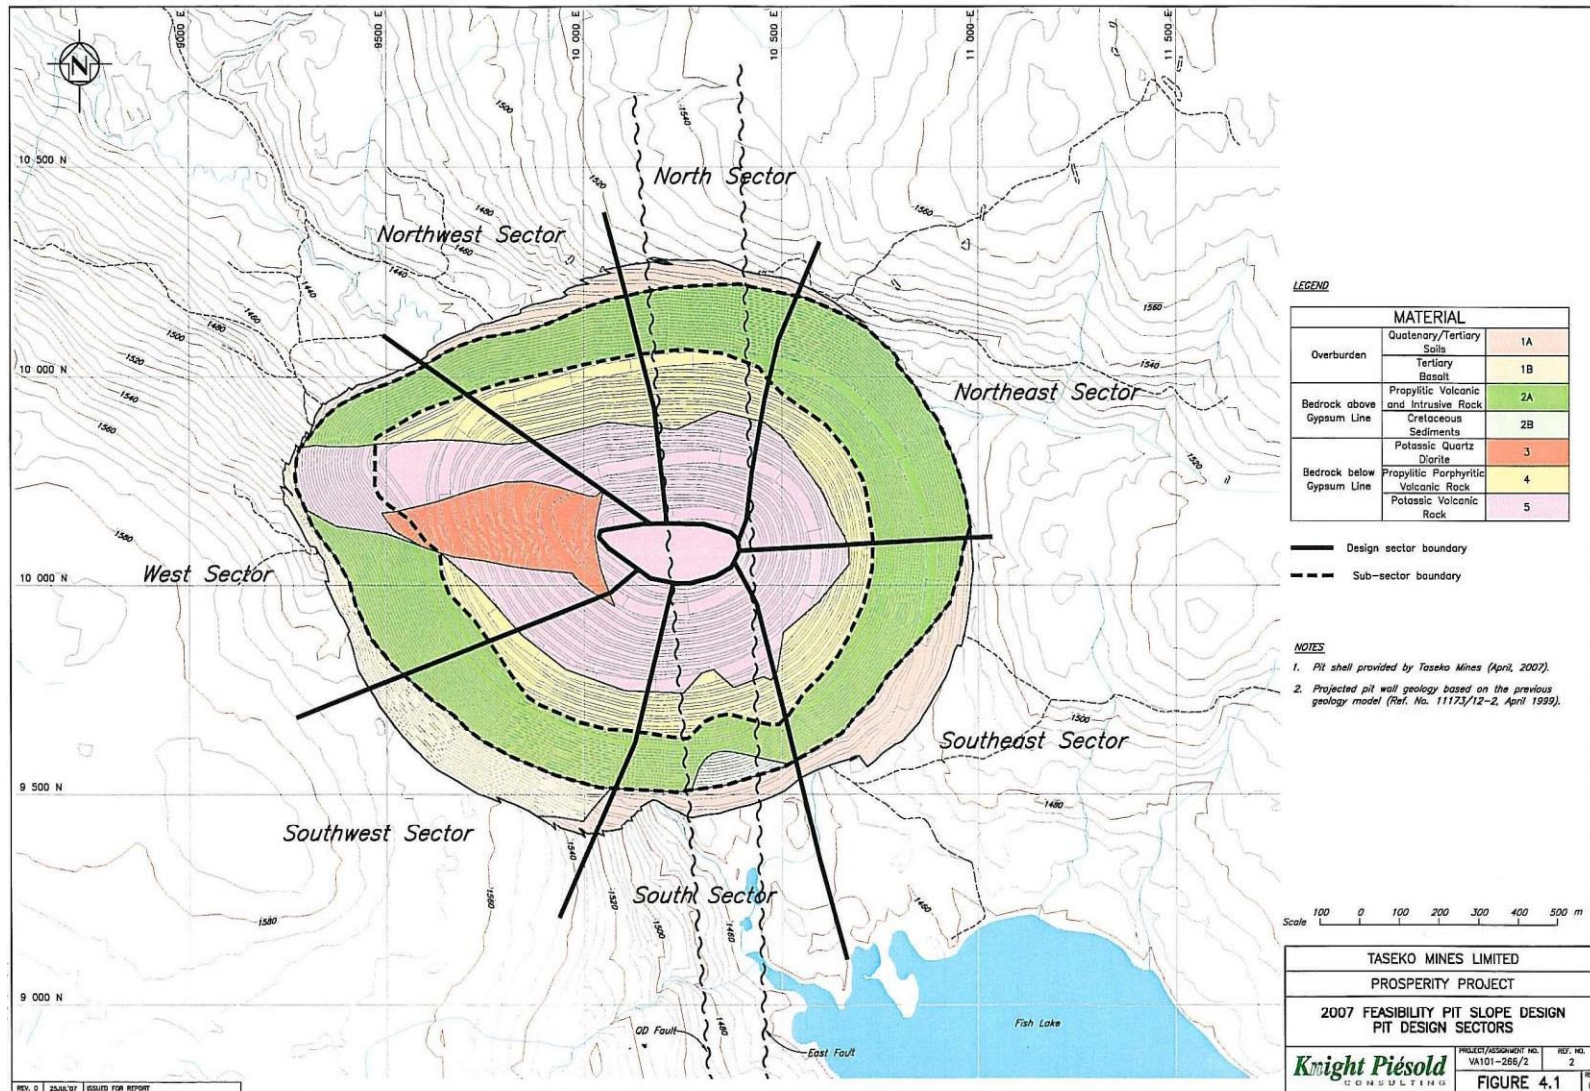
Geotechnical Pit Slope Design Sectors Plan
